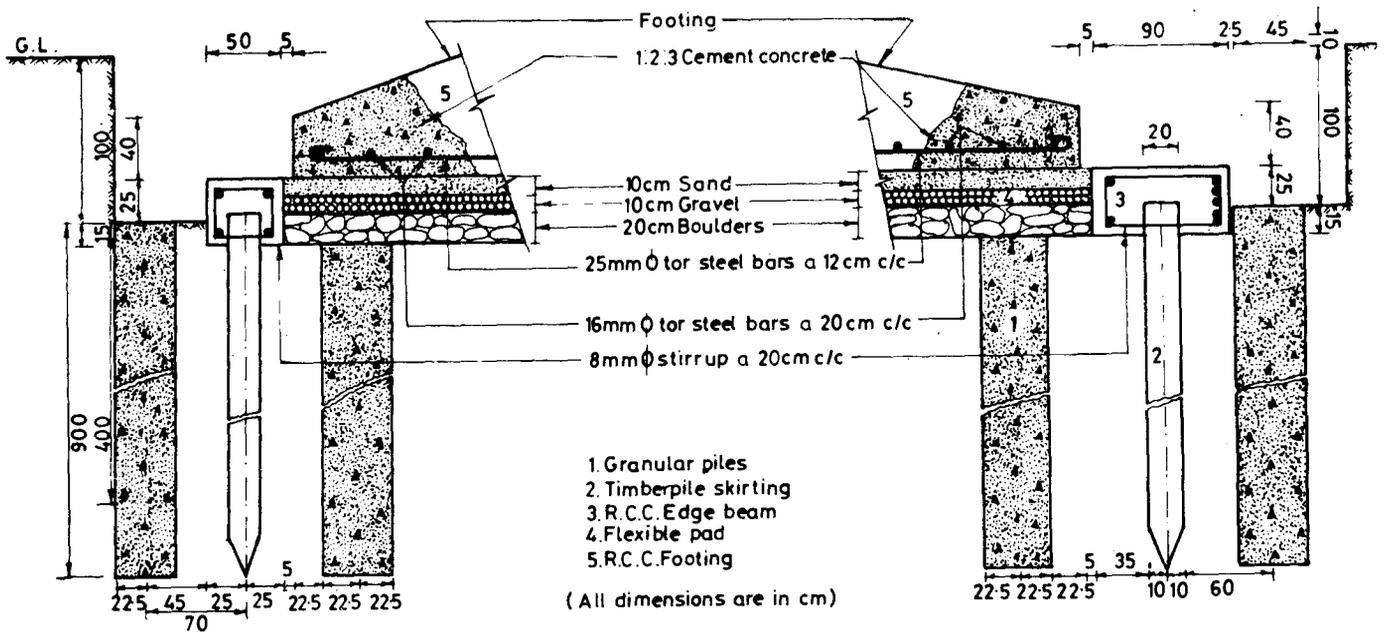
DETAILS OF EDGE BEAM & TIMBER PILE SKIRTING
